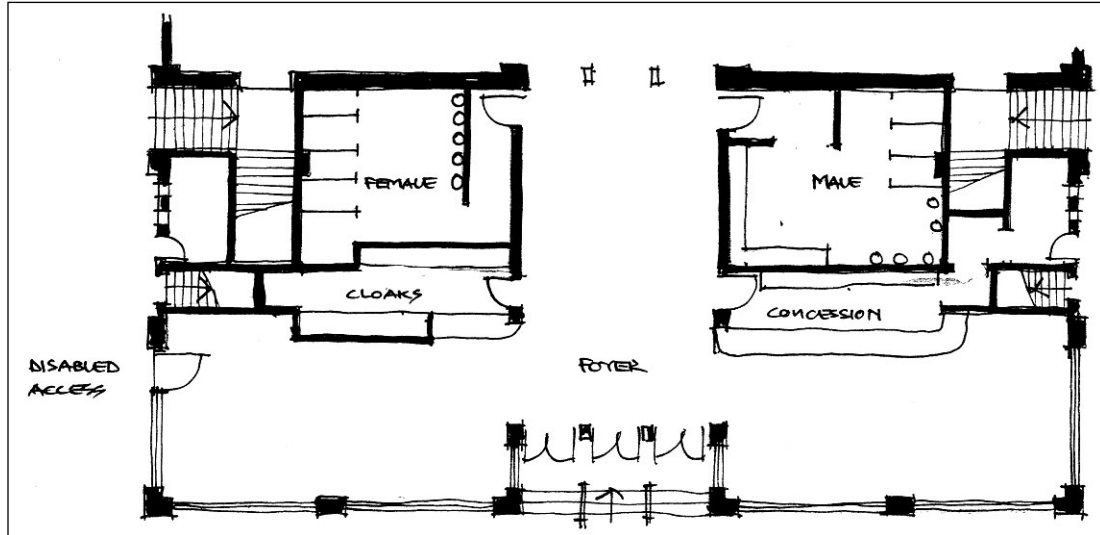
Potential layout of foyer and Macquarie Street ground floor section of building. Provision has been made for a smaller cloak room, a concession to operate during performances and tighter planned toilet facilities.
